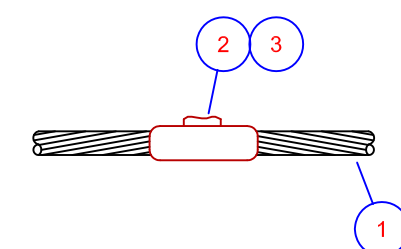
DETAIL NO.	GROUND CABLE		MOLD (3)	CARTRIDGE (4)
